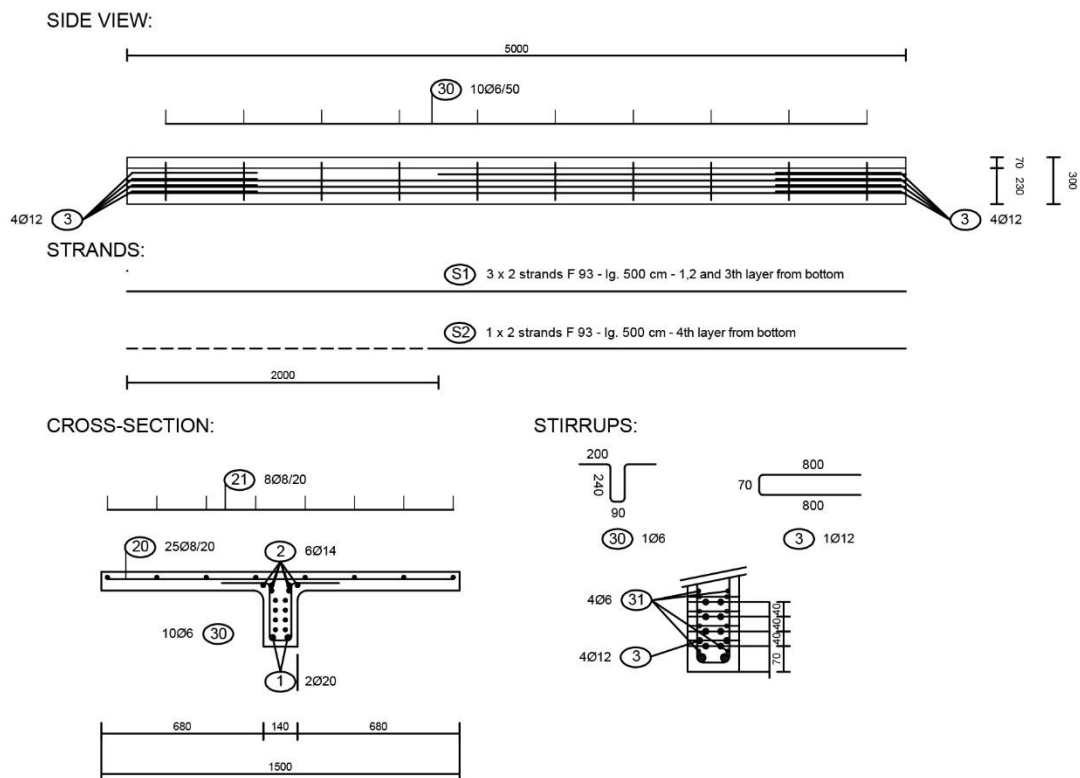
The detailed reinforcement (adapted from Strauss et al. 2017).
